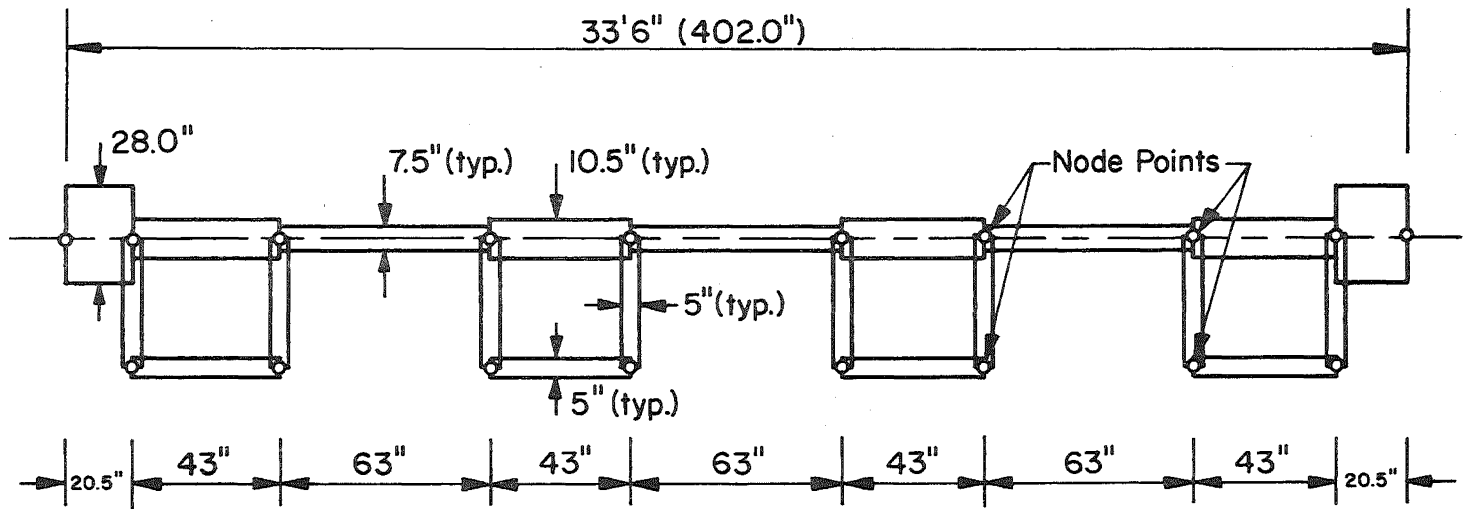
Idealization of the Cross Section - Brookville Bridge
